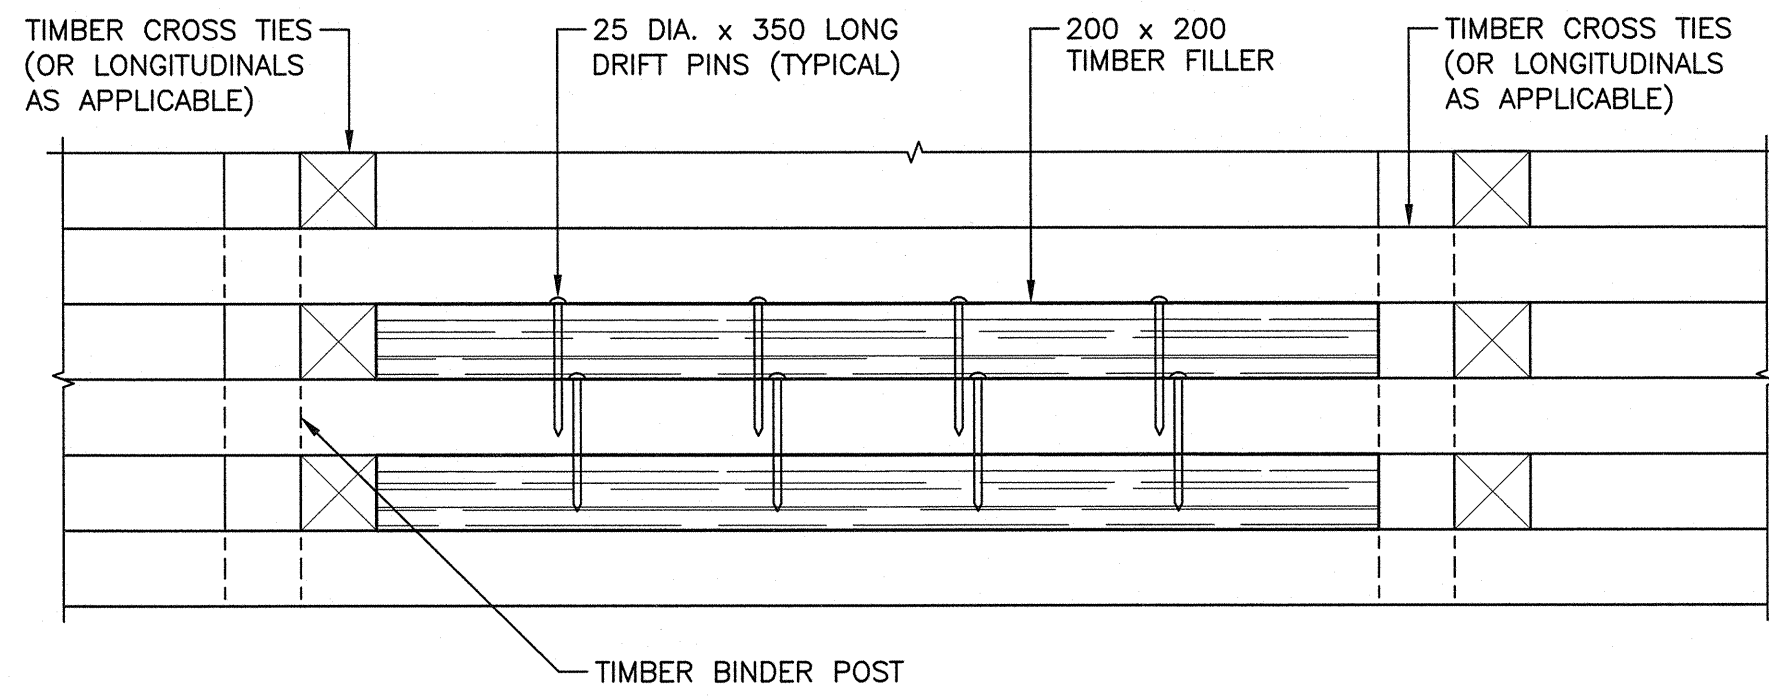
DETAIL - LONGITUDINAL BOTTOM SPLICE 2
